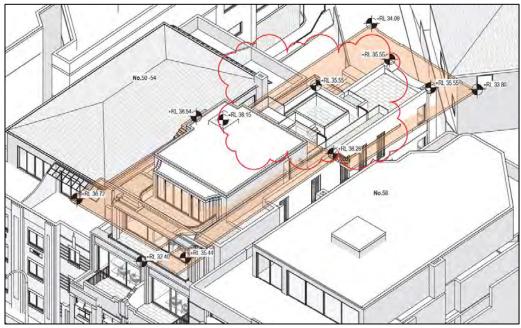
15m height plane plan, showing portions of the development that breach height above the orange shaded area. (Source: AN+A, 2023)
